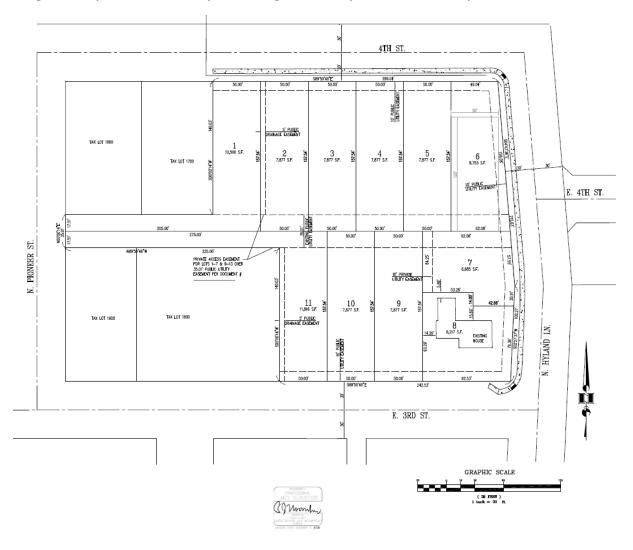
Proposed subdivision layout creating 11 new lots for residential development.
